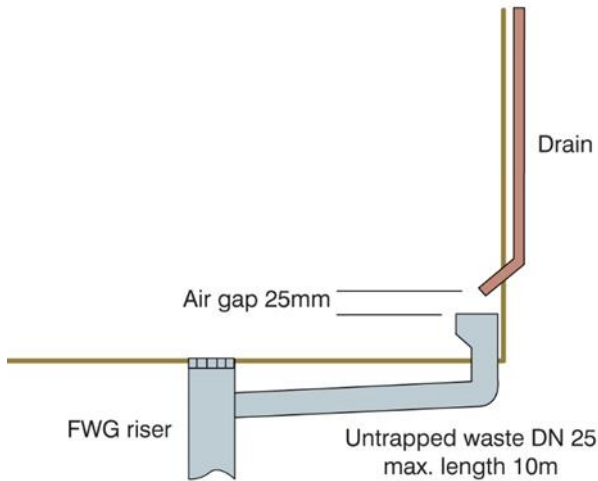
A discharge pipe to a sanitary drainage system via a tundish to a floor waste gully
